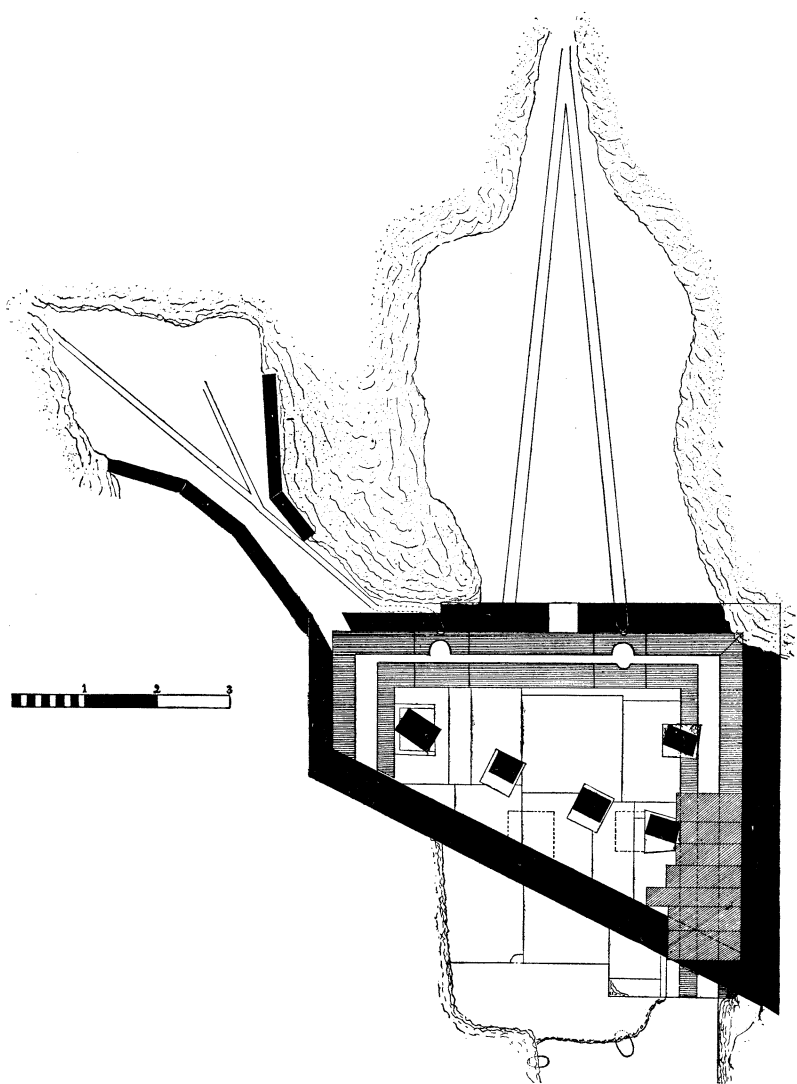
ANCIENT FOUNTAIN: GROUND PLAN OF EARLIER PORTION.
